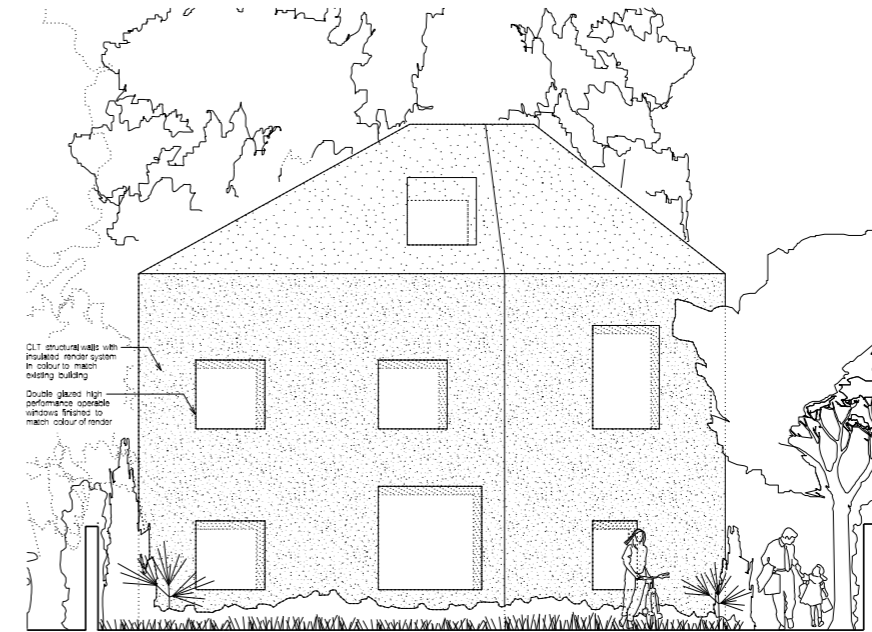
(R) Pre-application west facing Headley Way elevation.
